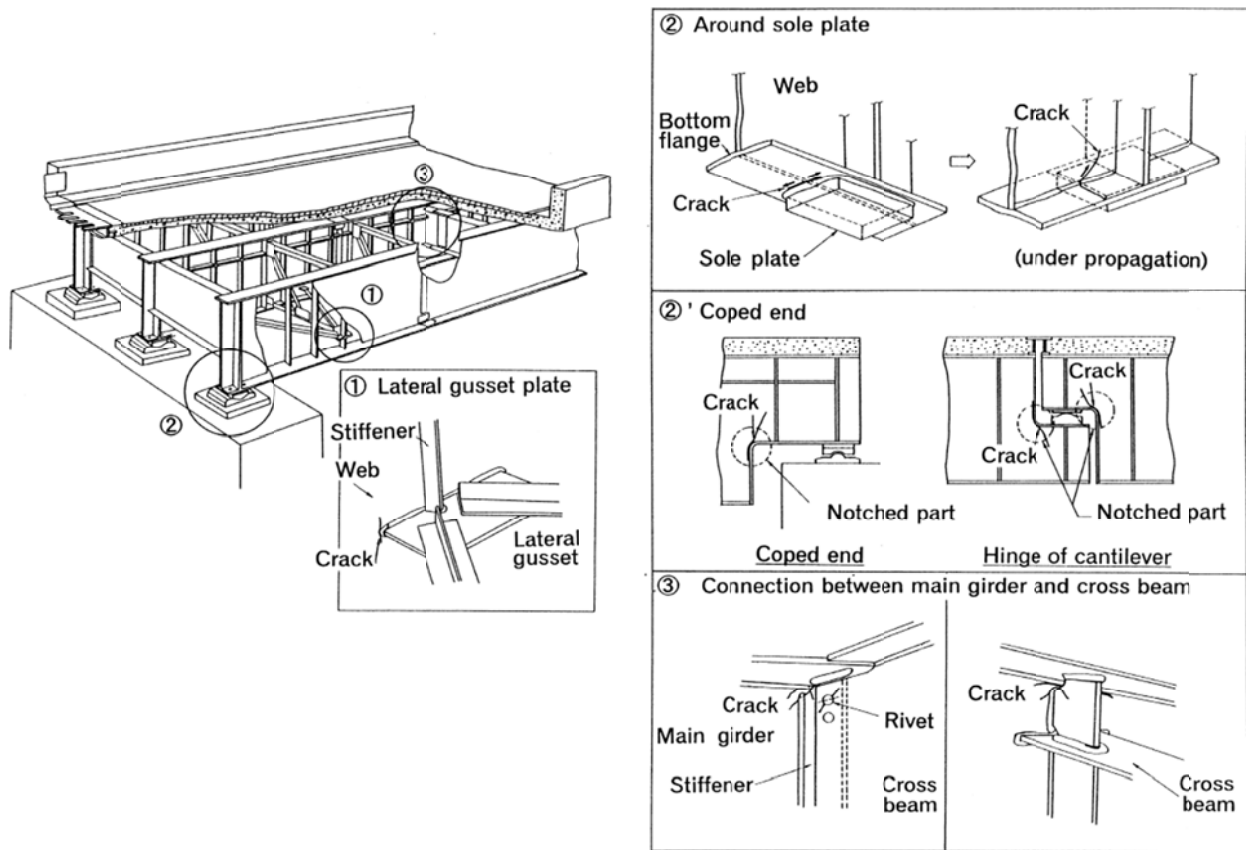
Typical fatigue cracks in plate girders (Nishikawa et al., 1998).
